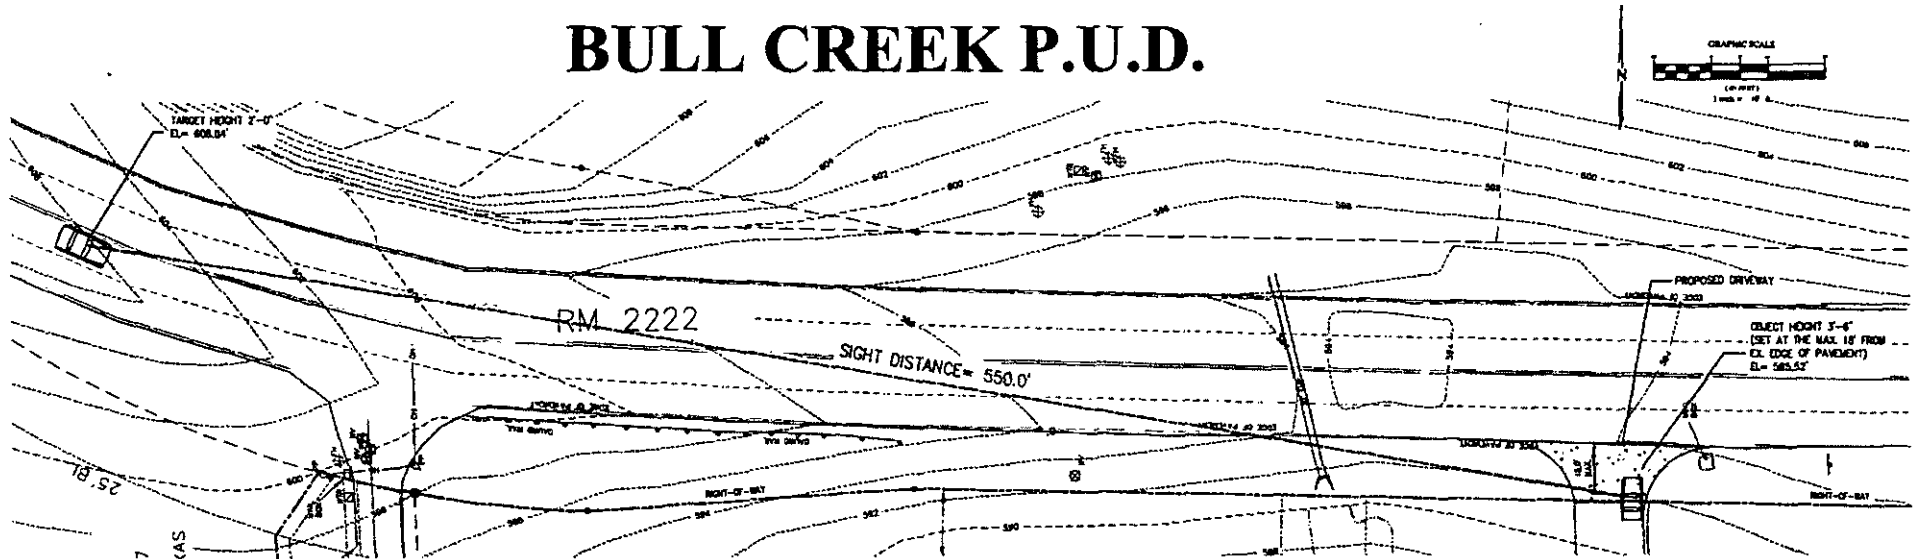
EXHIBIT M - DRIVEWAY DETAILS - (2 of 5)
